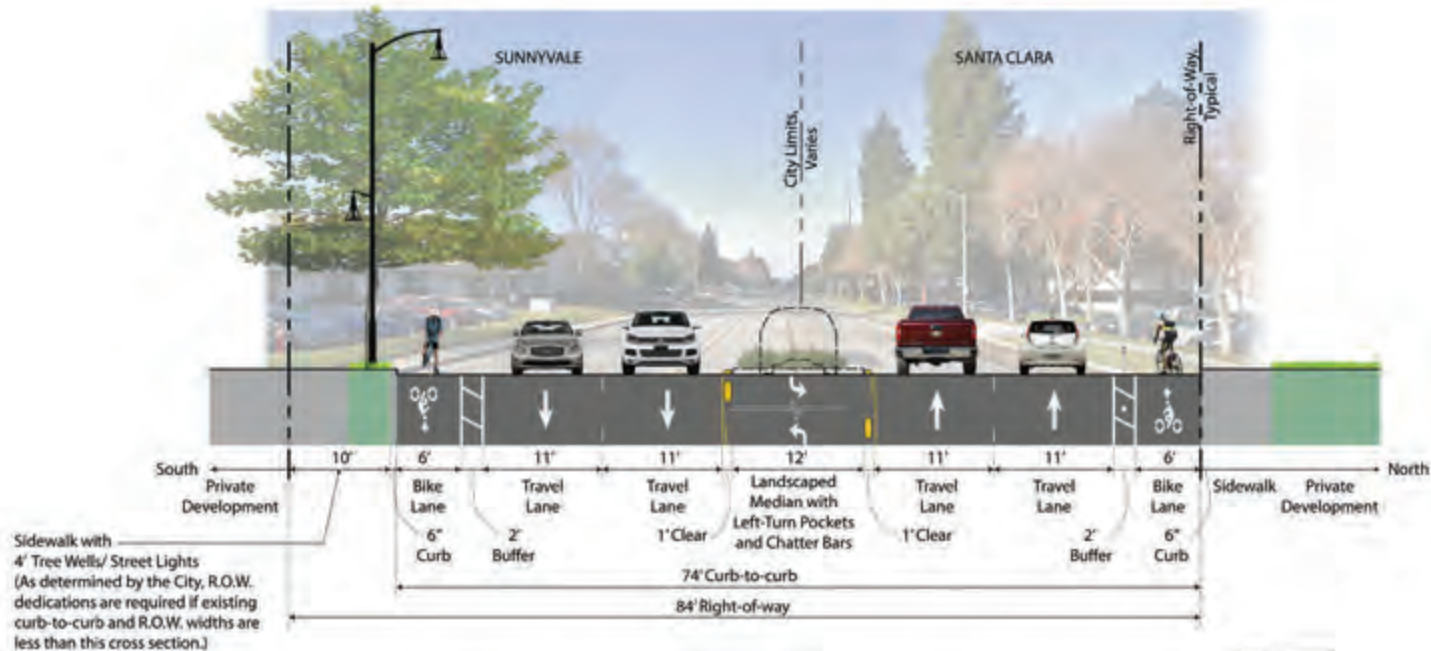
Santa Vittoria Terrace, Typical Cross Section
